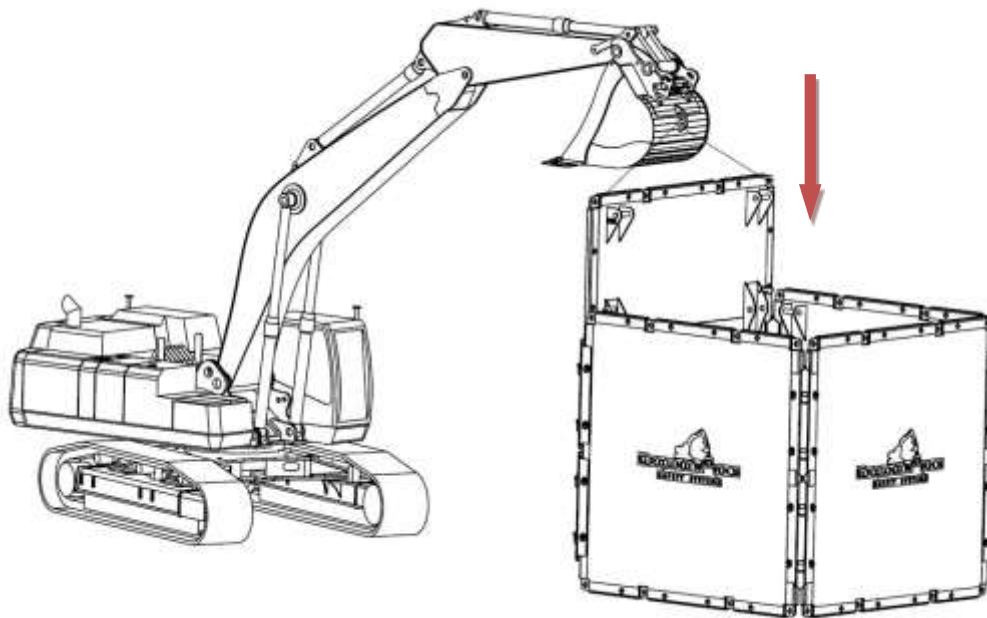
Pit Kit Step Eight – Installing the Fourth Panel
